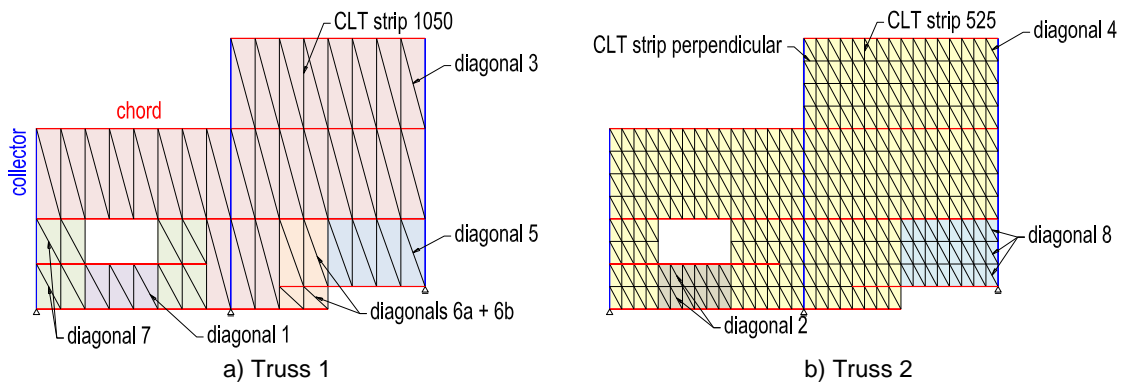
Diagonal layout for model F: a) truss 1; b) truss 2
